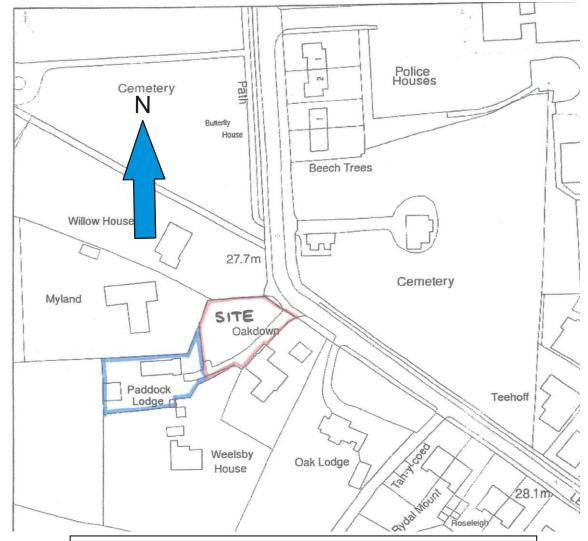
Site location at a scale of 1:1,250 (extract from Architects plan)
